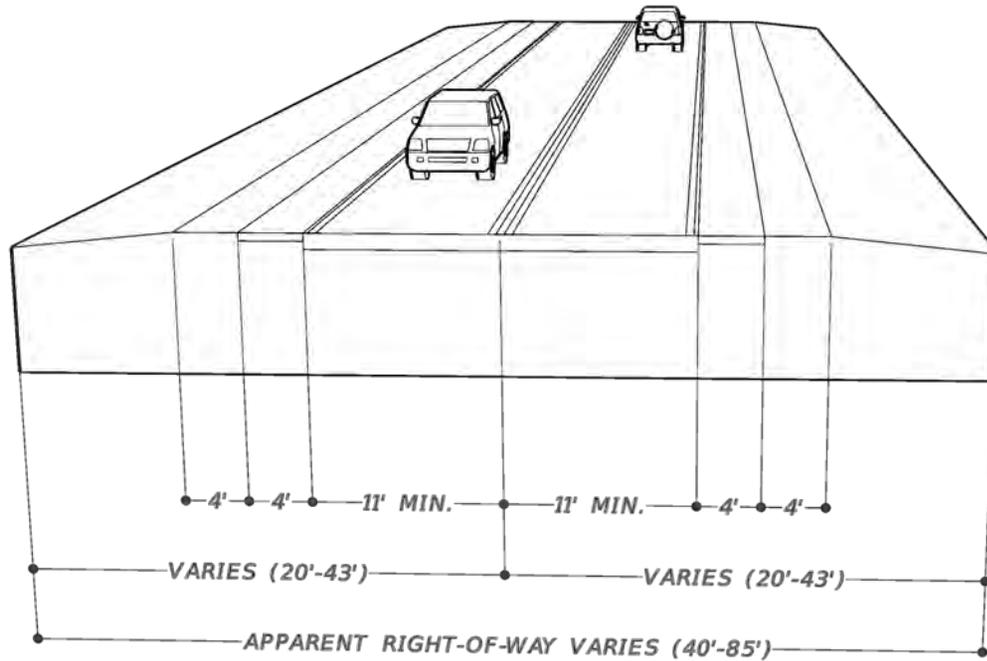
| Existing Typical Section – W. Altoona Road from Lakeview Terrace Drive to Lake Daisy Drive
